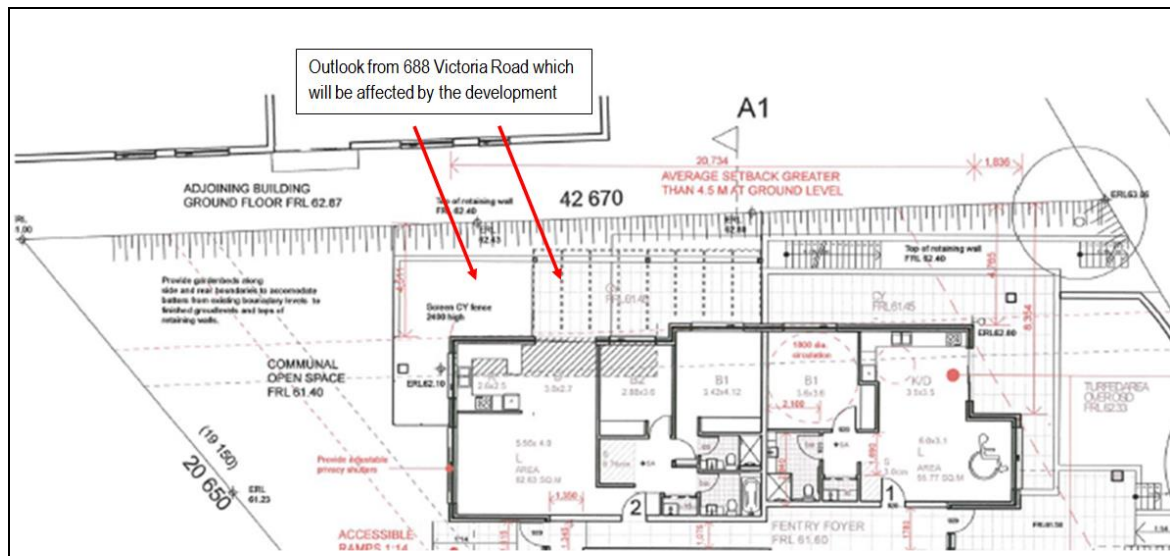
Location of 688 Victoria Road in relationship to the subject site. Views to the south will not be affected by the development.
